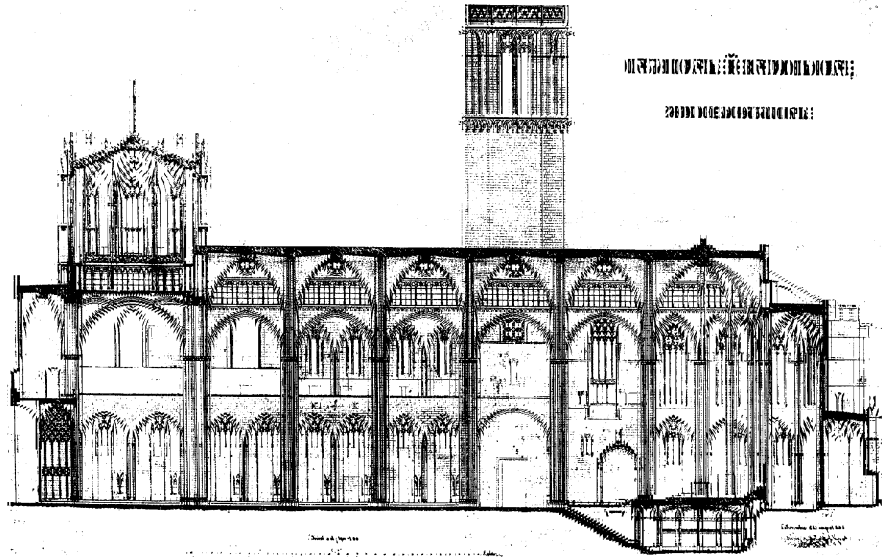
The longitudinal cross section of Barcelona Cathedral
